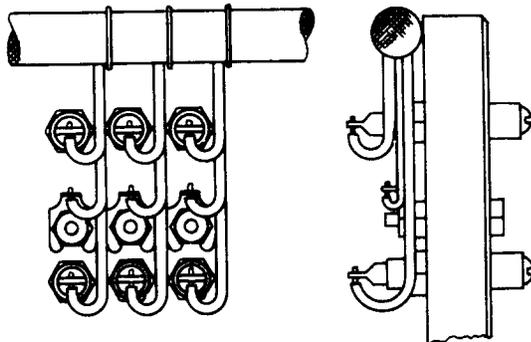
Fuse Posts — No. 5 and Similar Types — No. 14 Gauge and Smaller Wires
